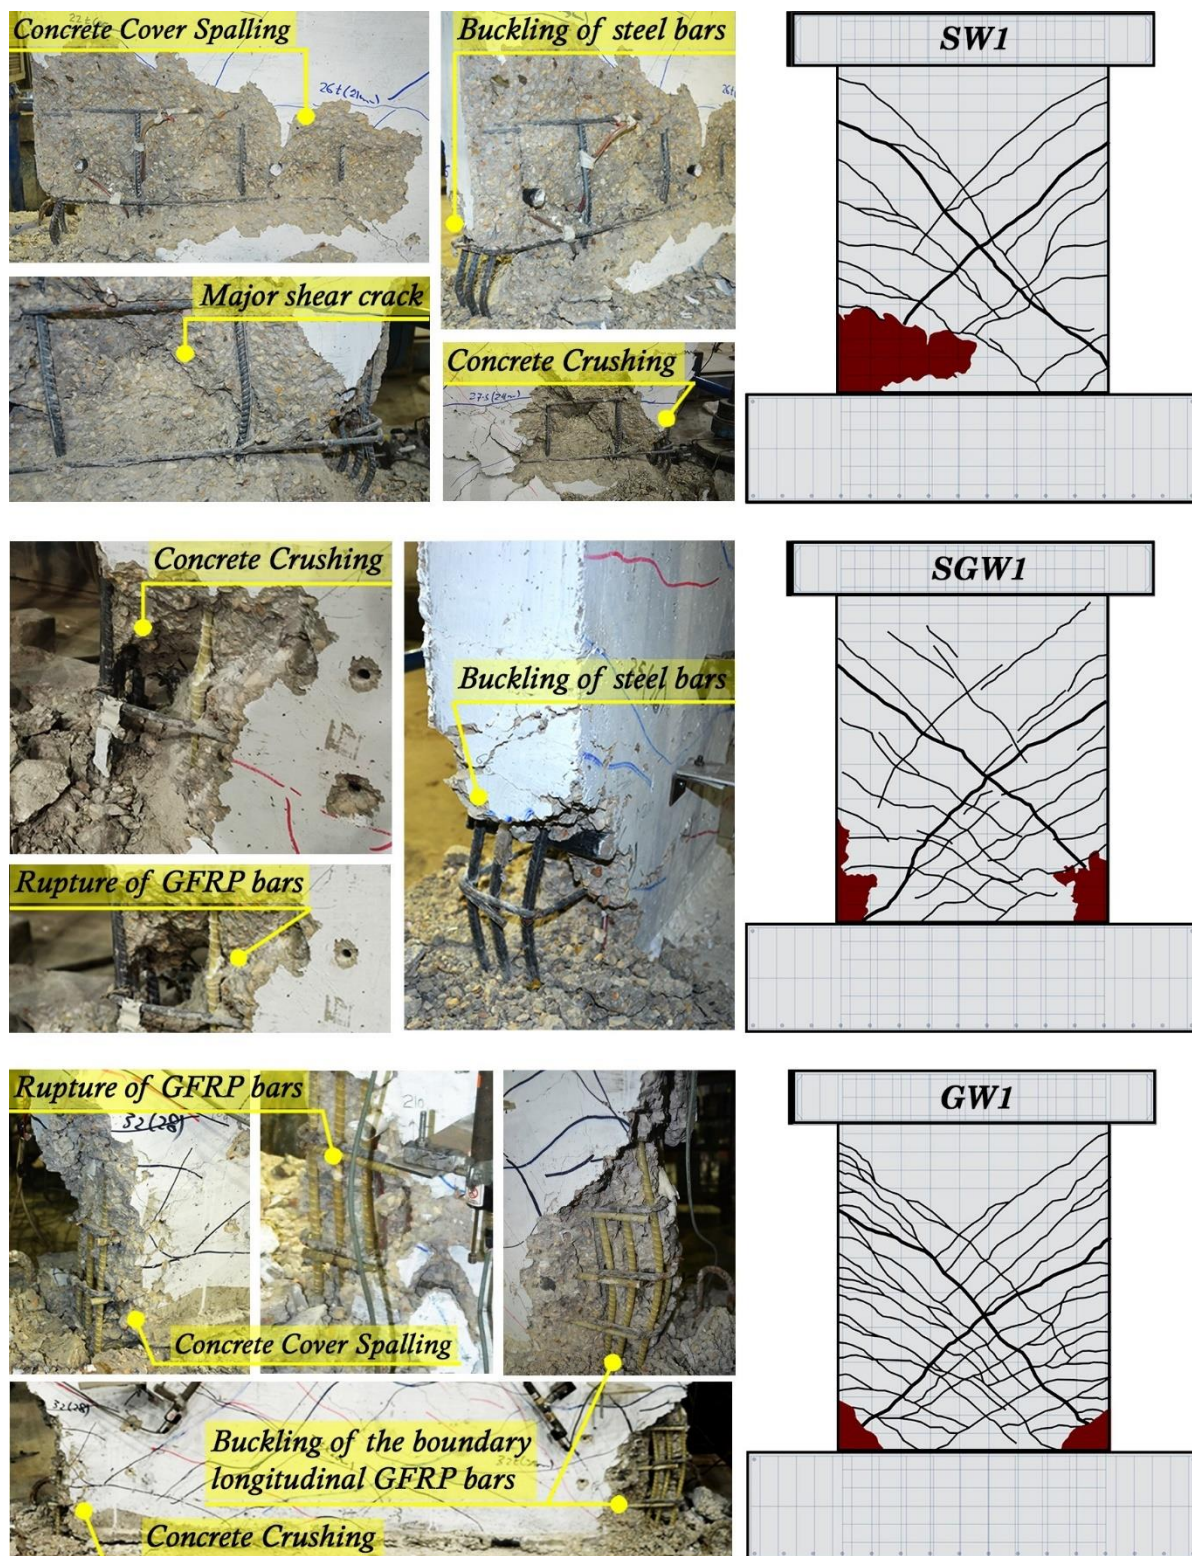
Crack patterns and damage observed at failure of walls SW1, SGW1 and GW1
